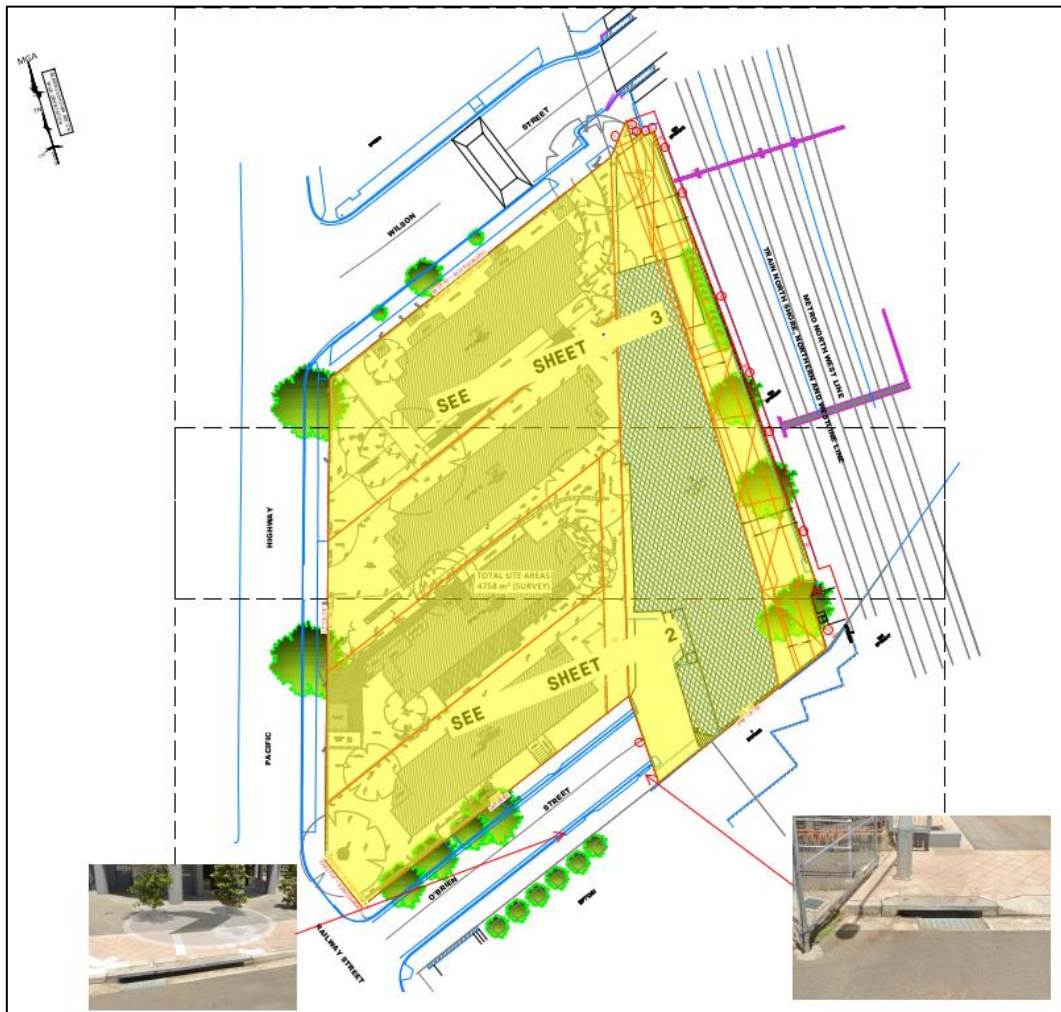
Existing Stormwater Infrastructure on O'Brien Street
